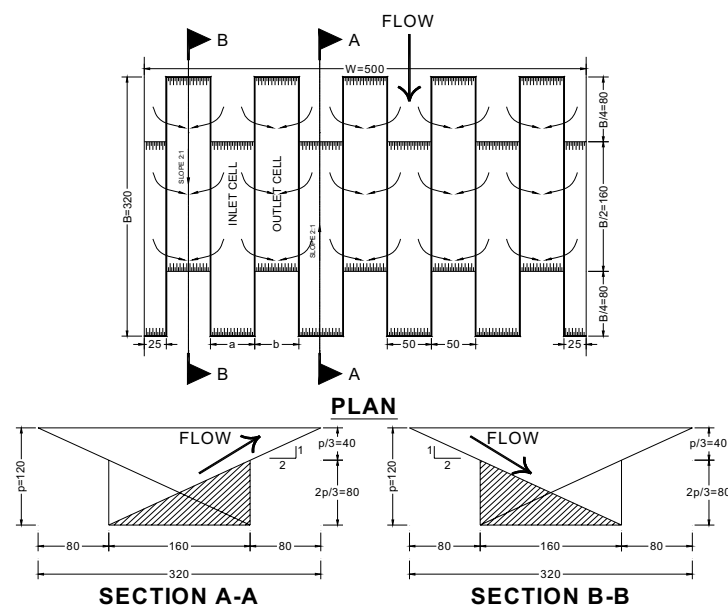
Plan and section of model P_2M_1 (both sides ramping), (dimensions in mm)
